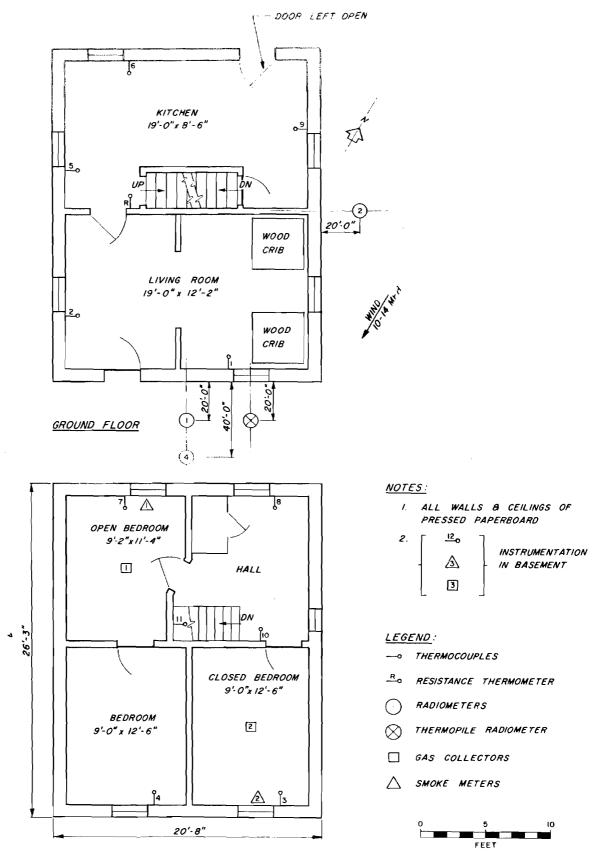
BUILDING No. 4 - TWO - STOREY WOOD FRAME DWELLING WITH CLAPBOARD EXTERIOR AND BRICK INFILLING
